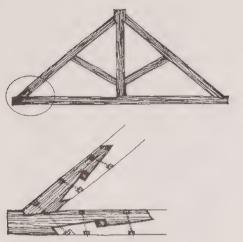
A wood frame repaired by replacing missing or deteriorated sections with new materials spliced in with appropriate joints.
